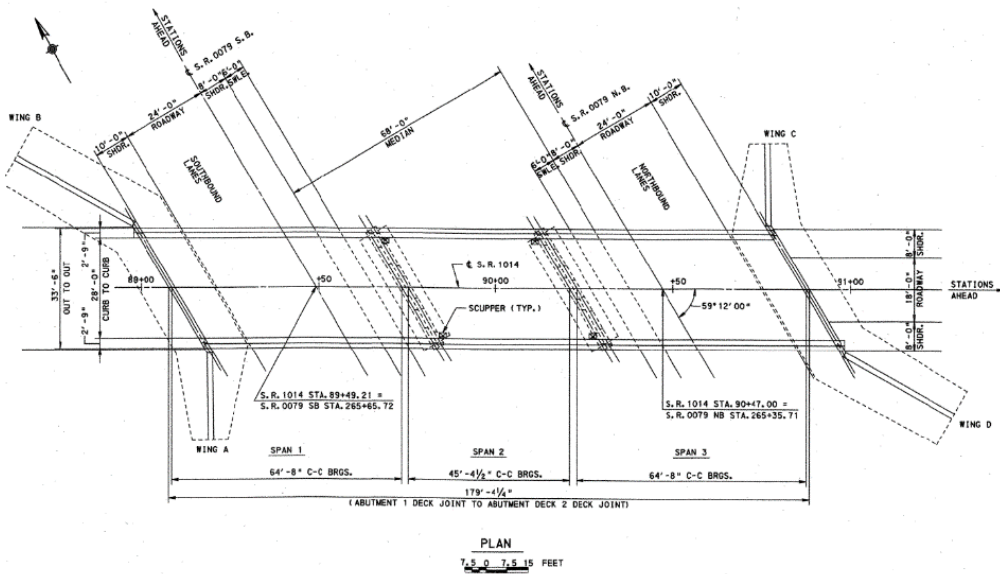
As-Built Plan (Plan View) Bridge No. 22383
